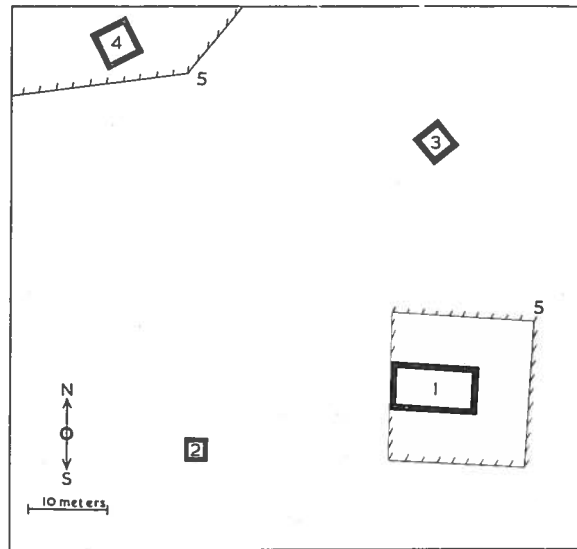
Plan of observatory site with surroundings. Numbers refer to: (1) variometer house, (2) absolute house, (3) unoccupied cottage, (4) owner's new dwellinghouse, (5) fence.
